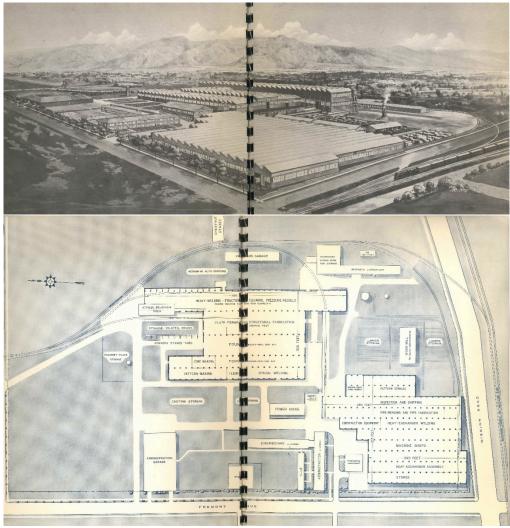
Rendering and site plan from CF Braun & Company, Studies of a Modern Manufacturing Plant, 1928 to 1938.
